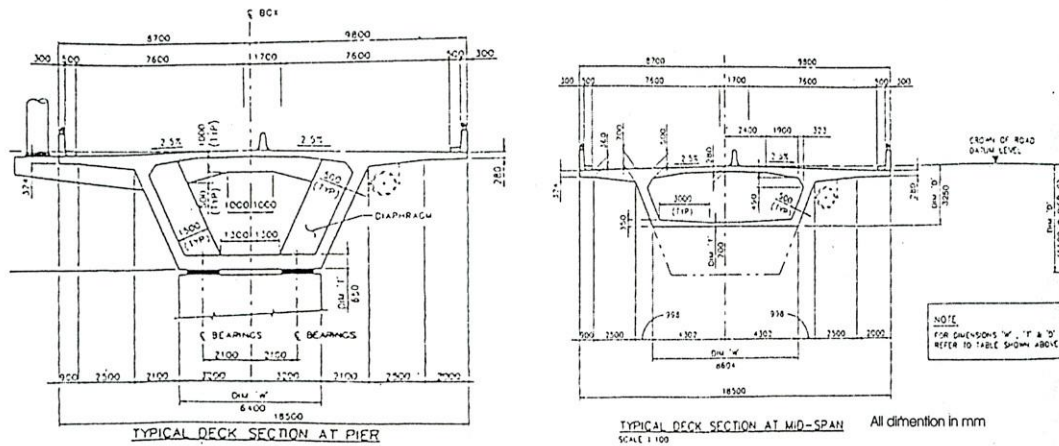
Typical Deck section at pier and at mid span respectively.
